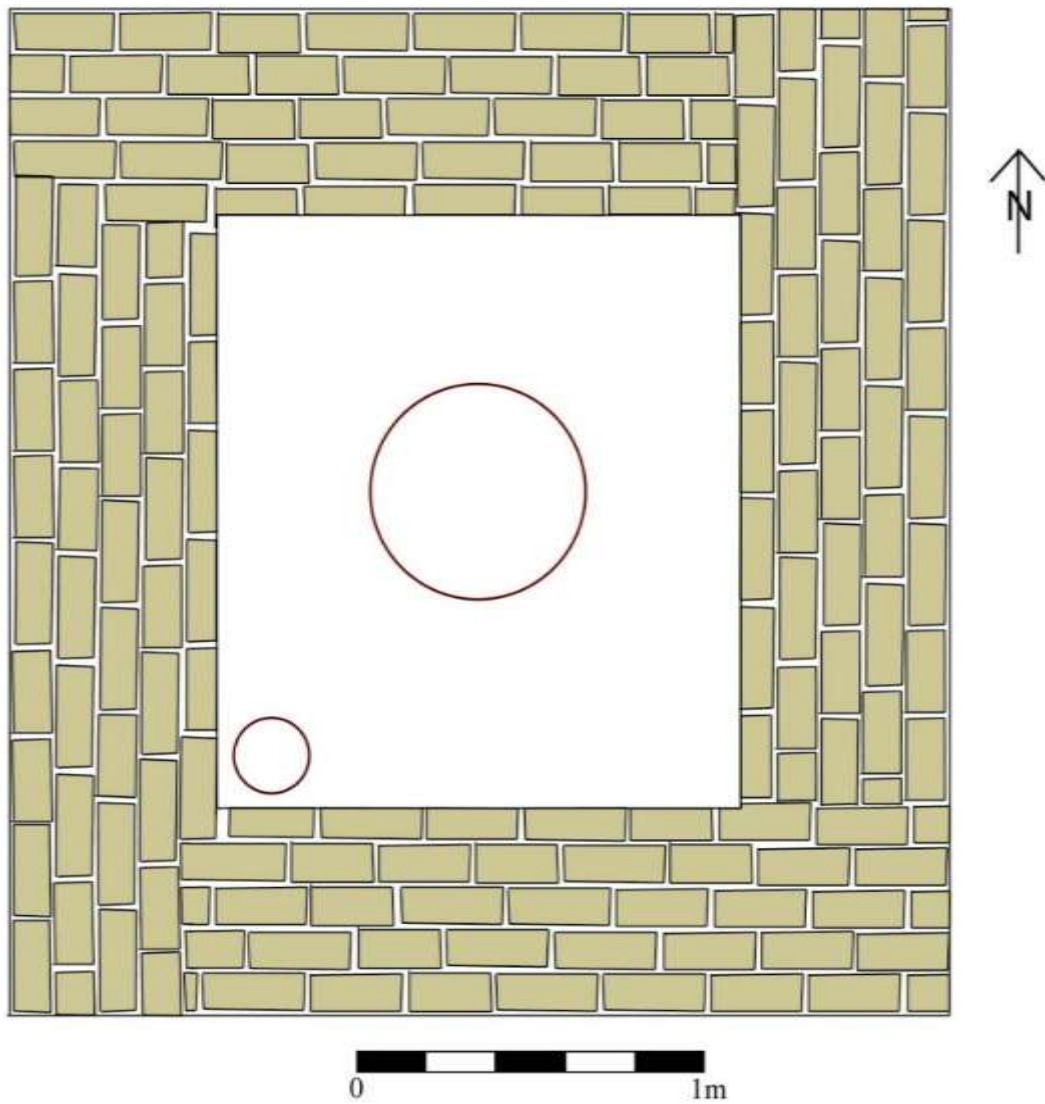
Plan of pump-chamber with pipe in centre and SW corner. Original drawn at 1:10.
